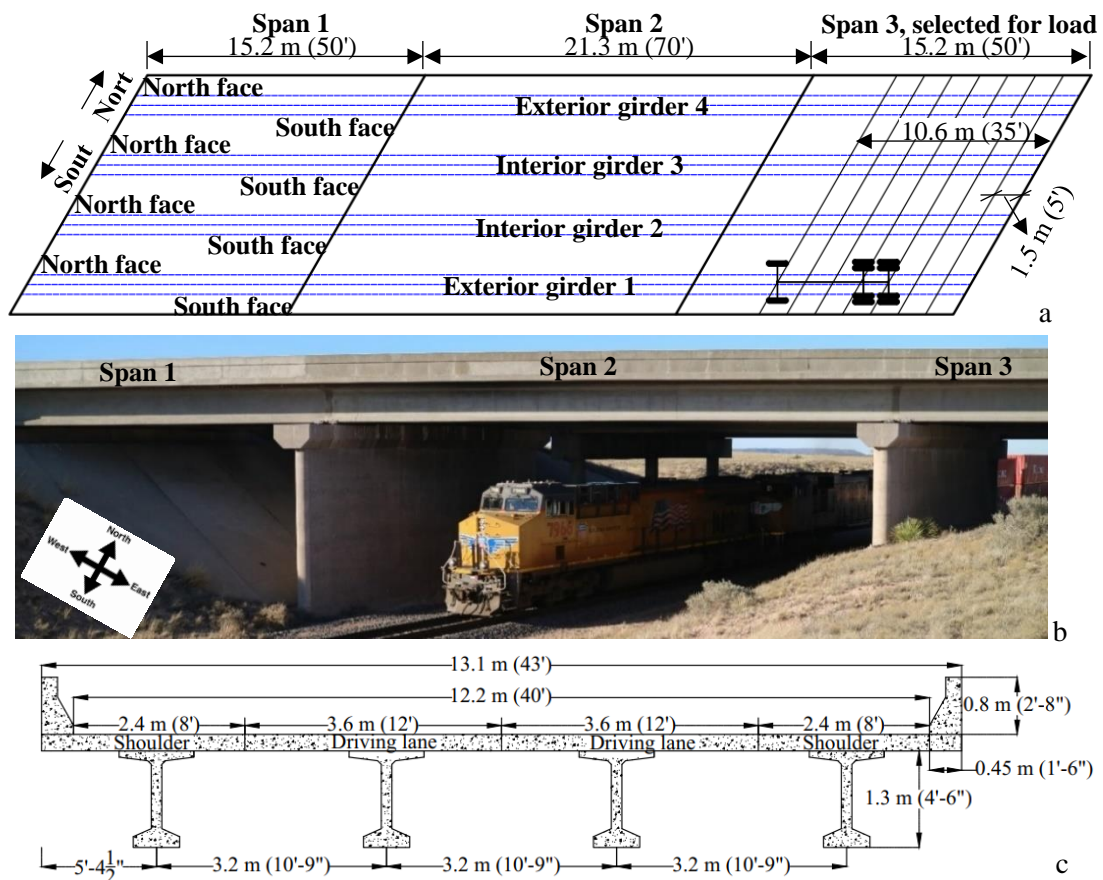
Bridge details, a: plan view; b: photograph of the bridge; c: cross section
